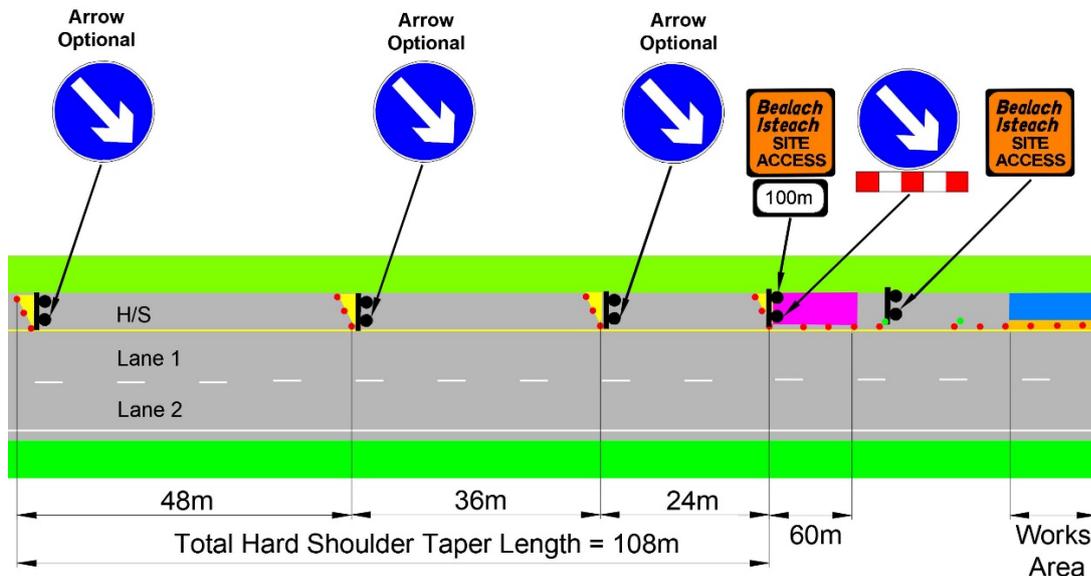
Motorway Hard Shoulder Closure
